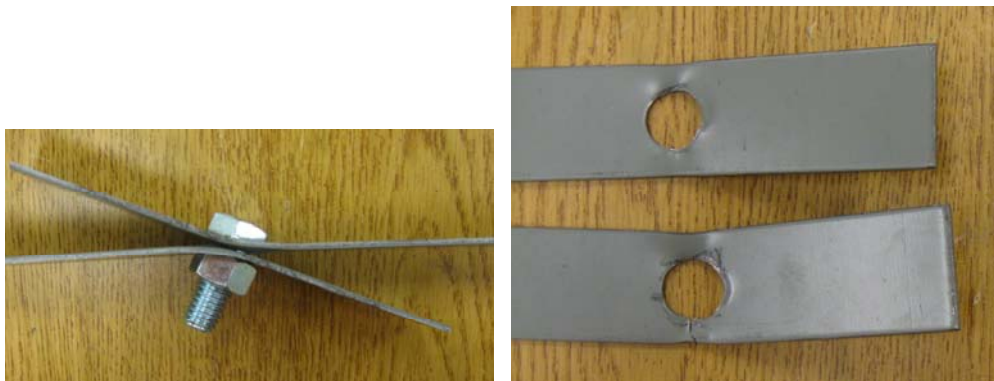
Rupture Failure of Test Specimen 73O-73O-1/2-1-S-0.4-T1
